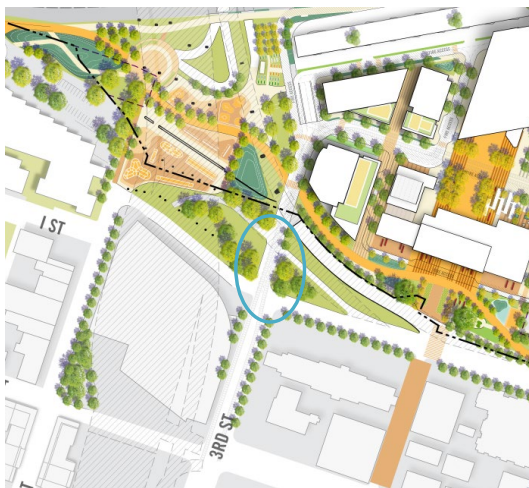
3RD STREET AT I STREET INTERSECTION
